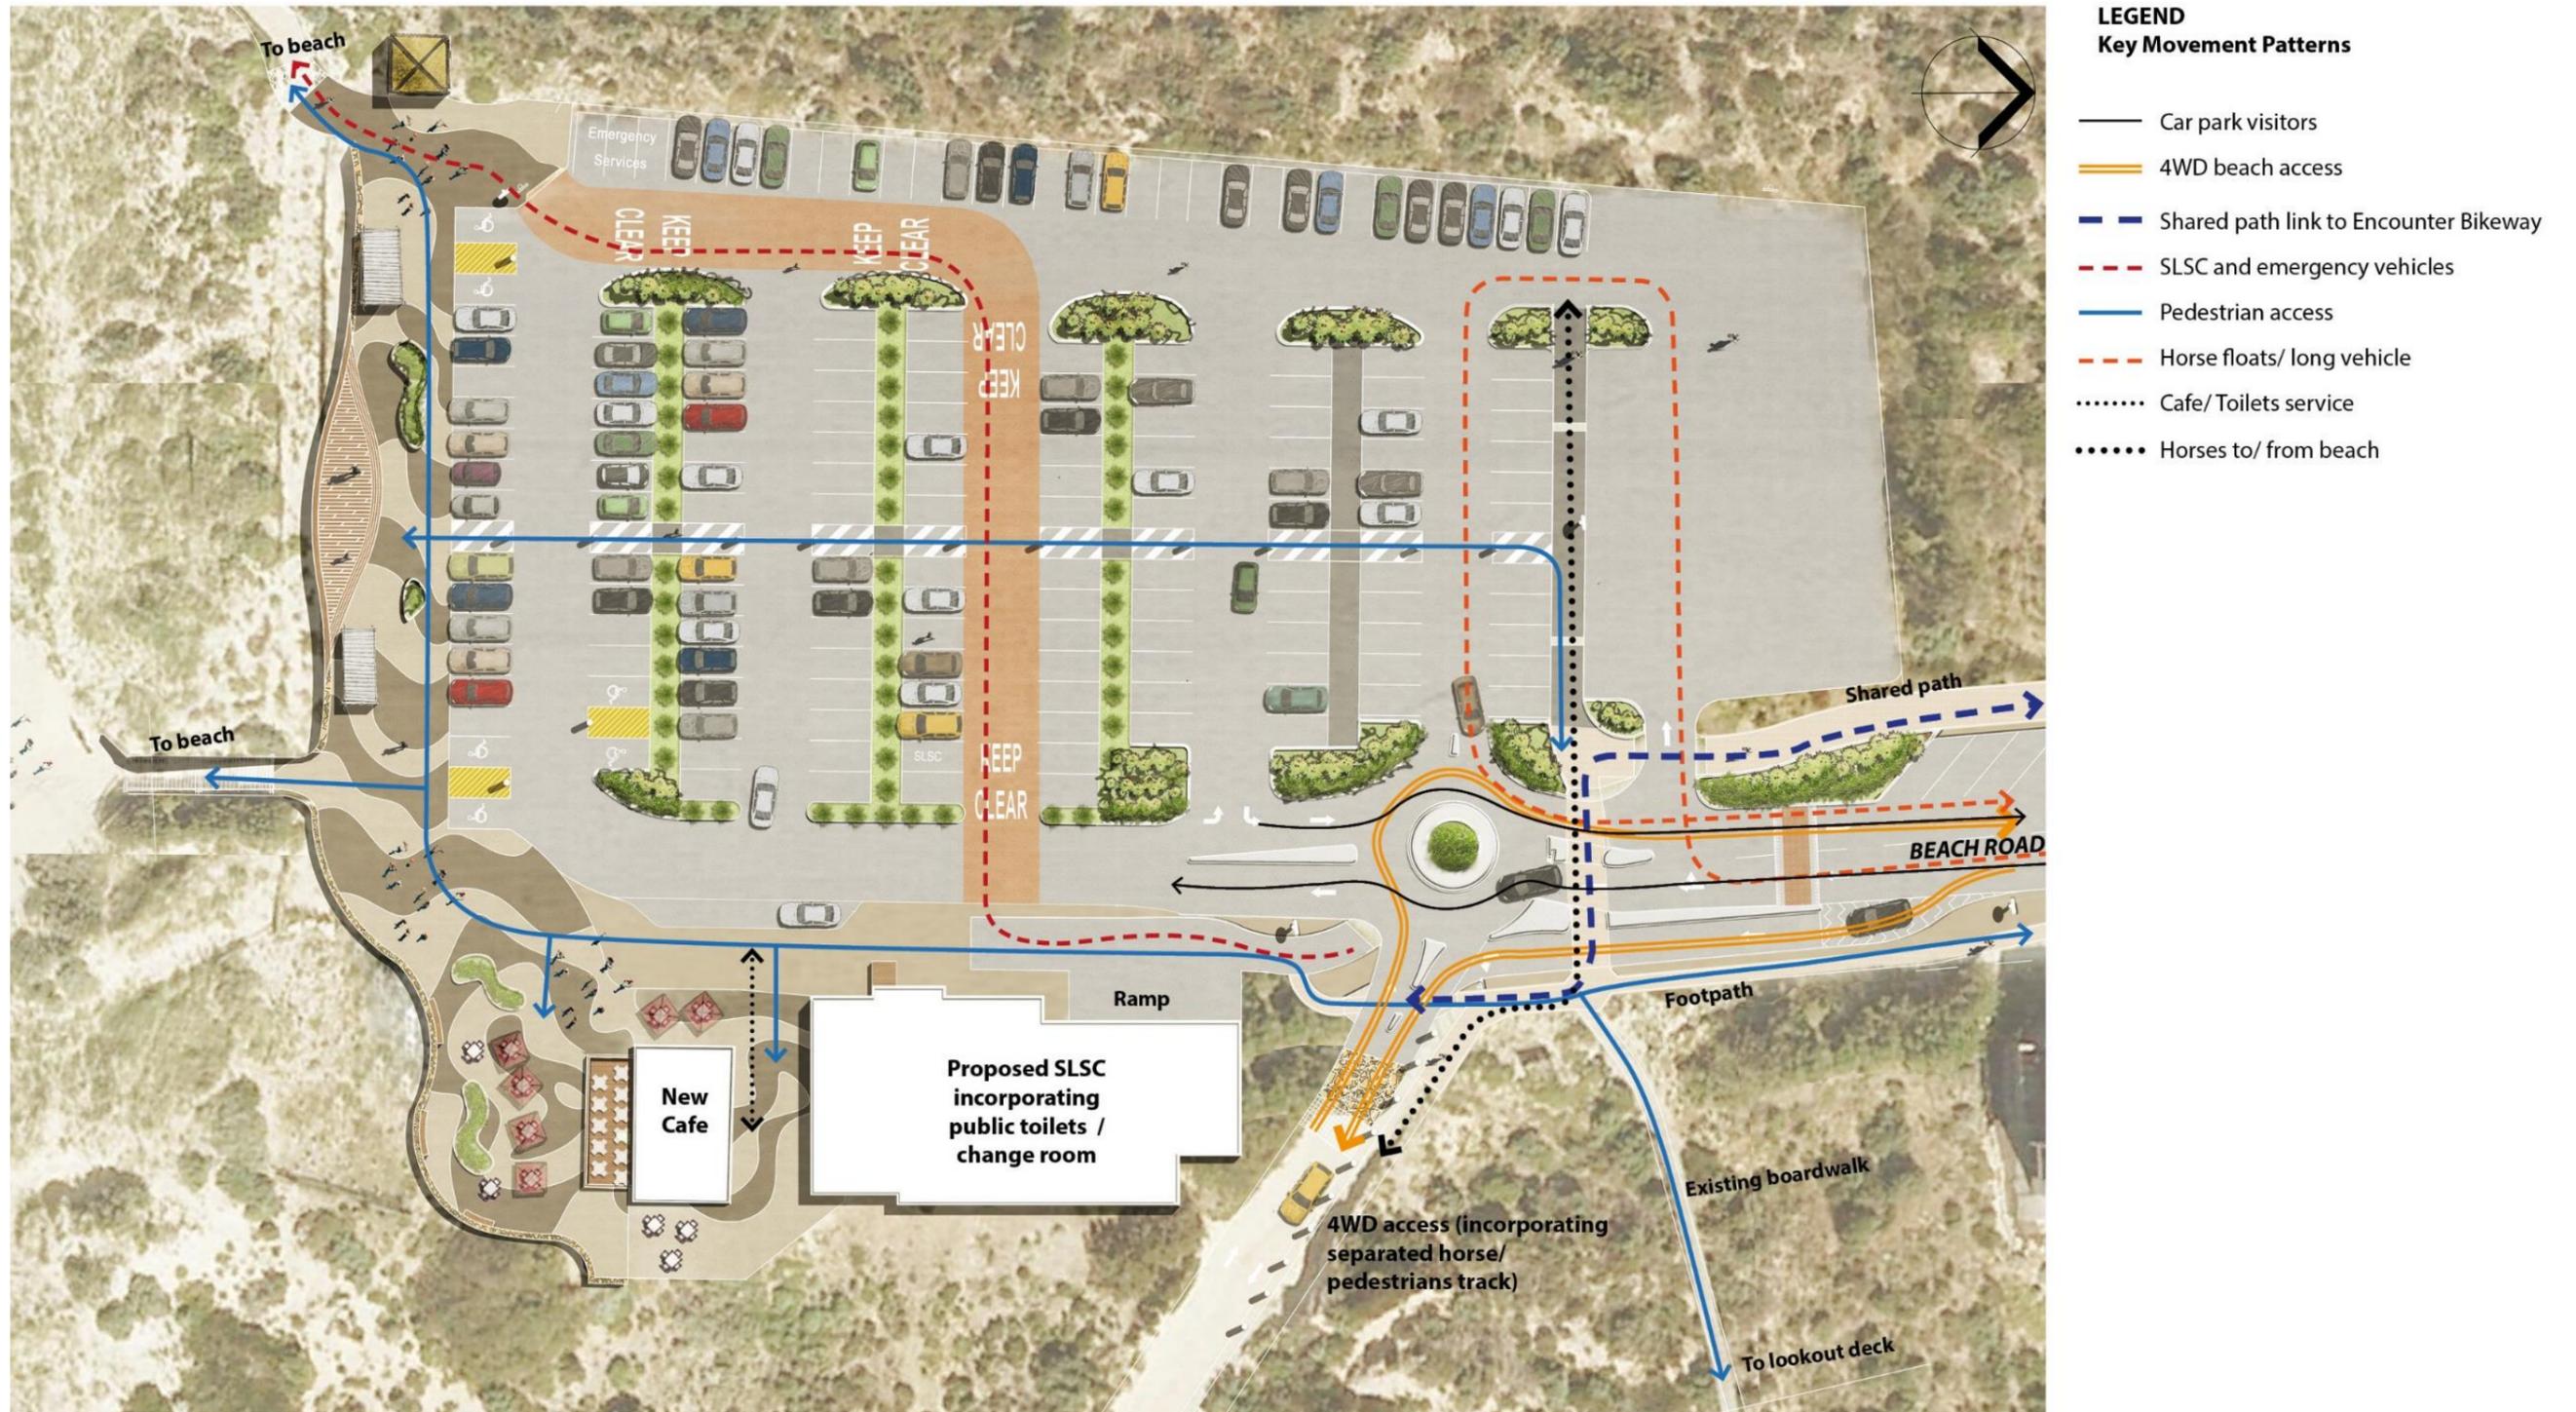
Goolwa Beach Car Park Draft Masterplan - Circulation Plan
